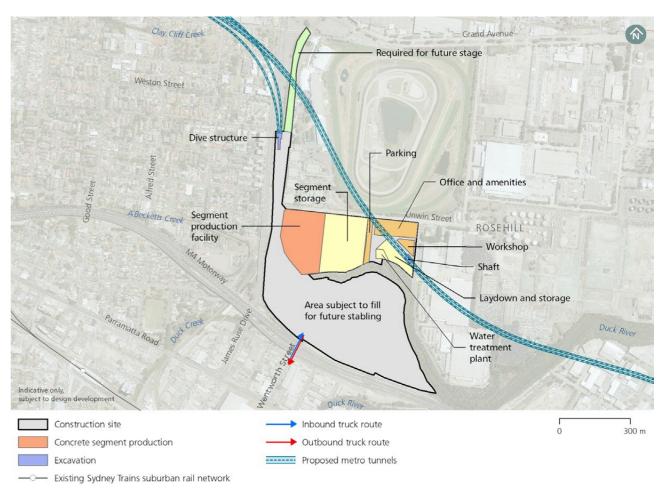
Clyde stabling and maintenance facility indicative construction site layout
